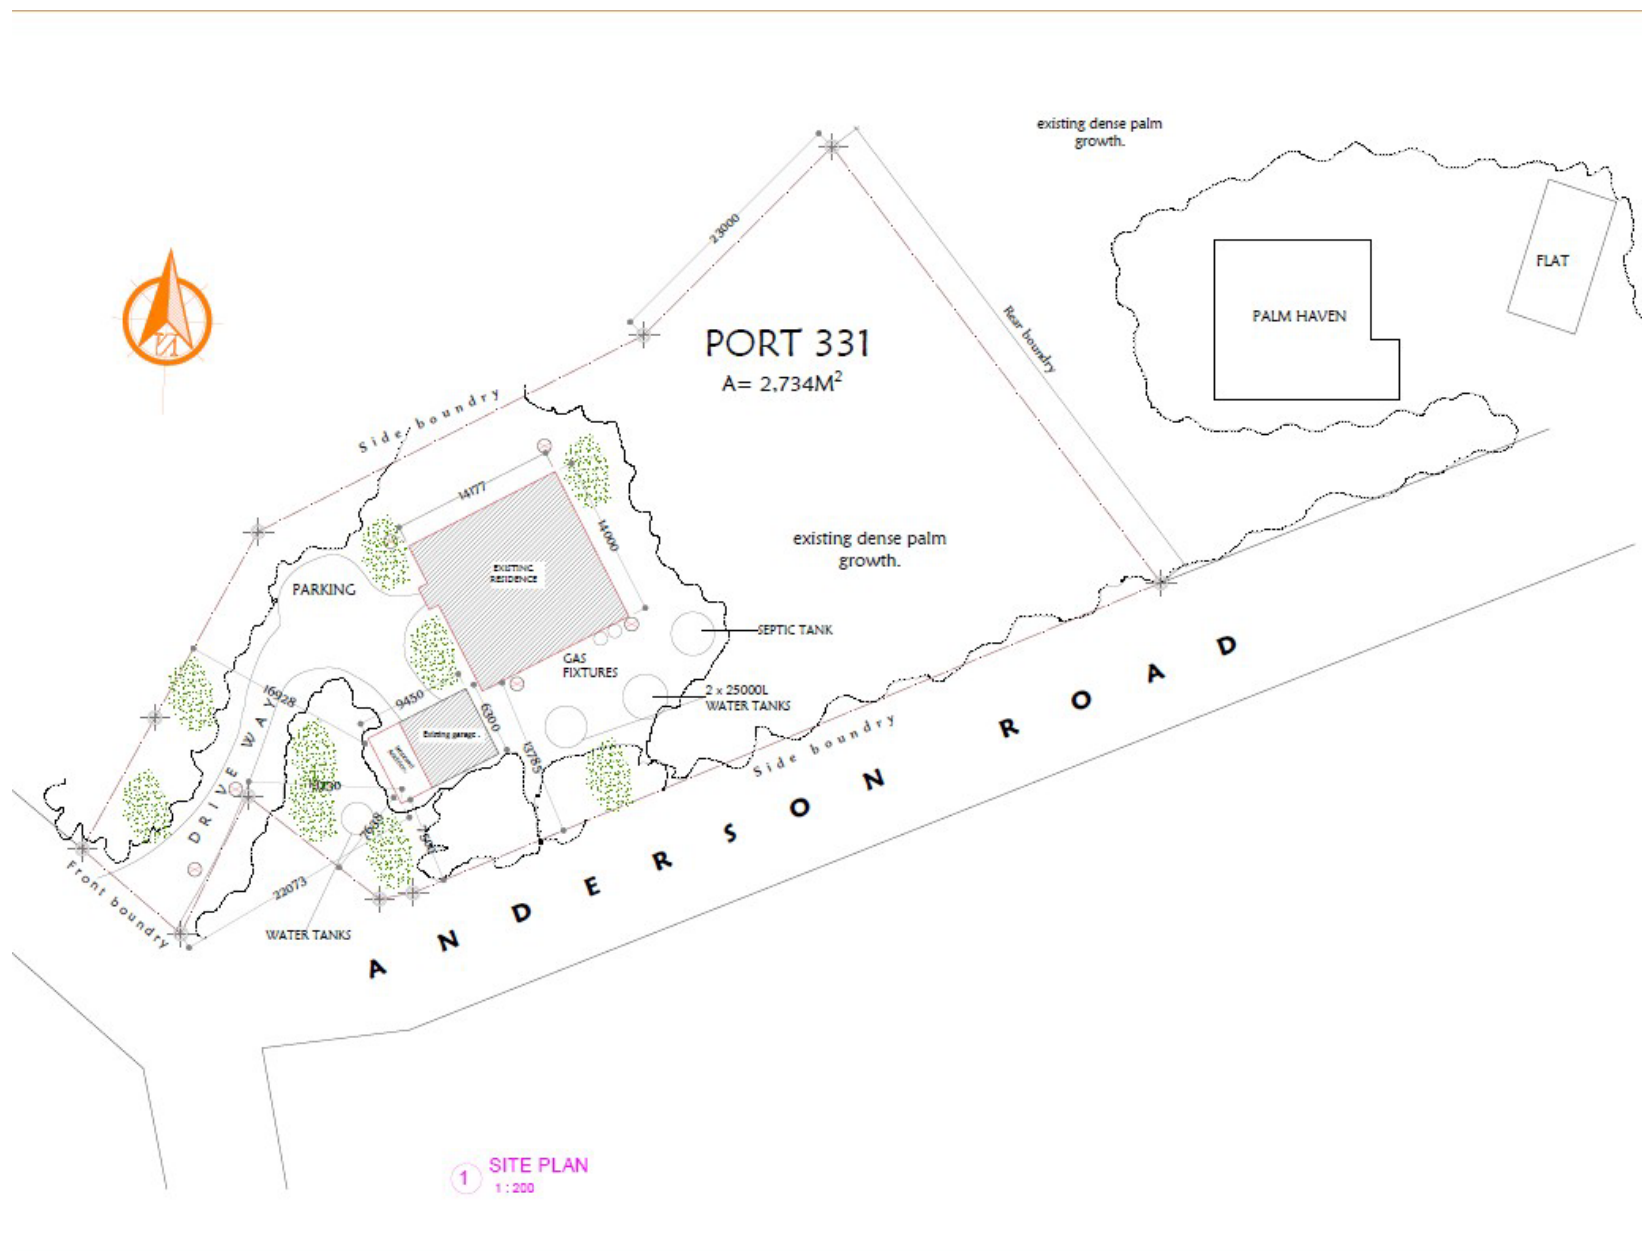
Applicant's submitted Site Analysis and Site Plan. – Dimensions to southern and western boundaries are inaccurate
